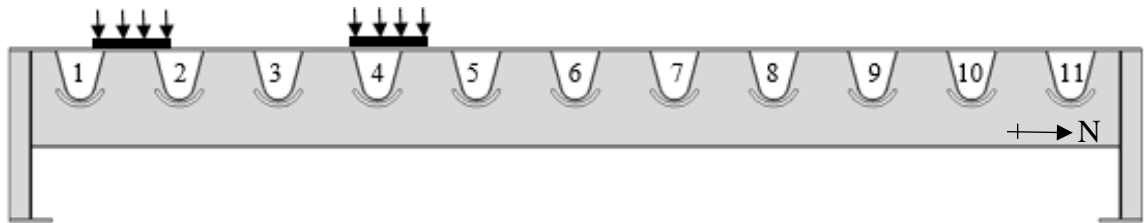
Illustration. Transverse load position of full tandem for independent floor beam under in-plane loading.
